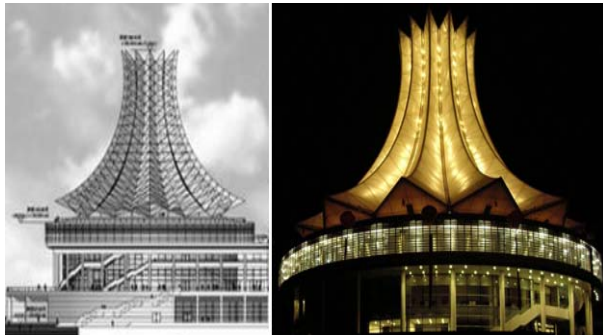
ICEC in Naning, China[16]. Left: Lattice folded structure roof of steel trusses[17]. Right: The roof structure being lighted from inside like a torch[16].
